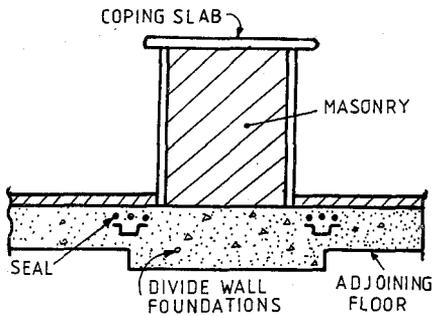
(a) Cross-section of Divide Wall on Pucca floor.
